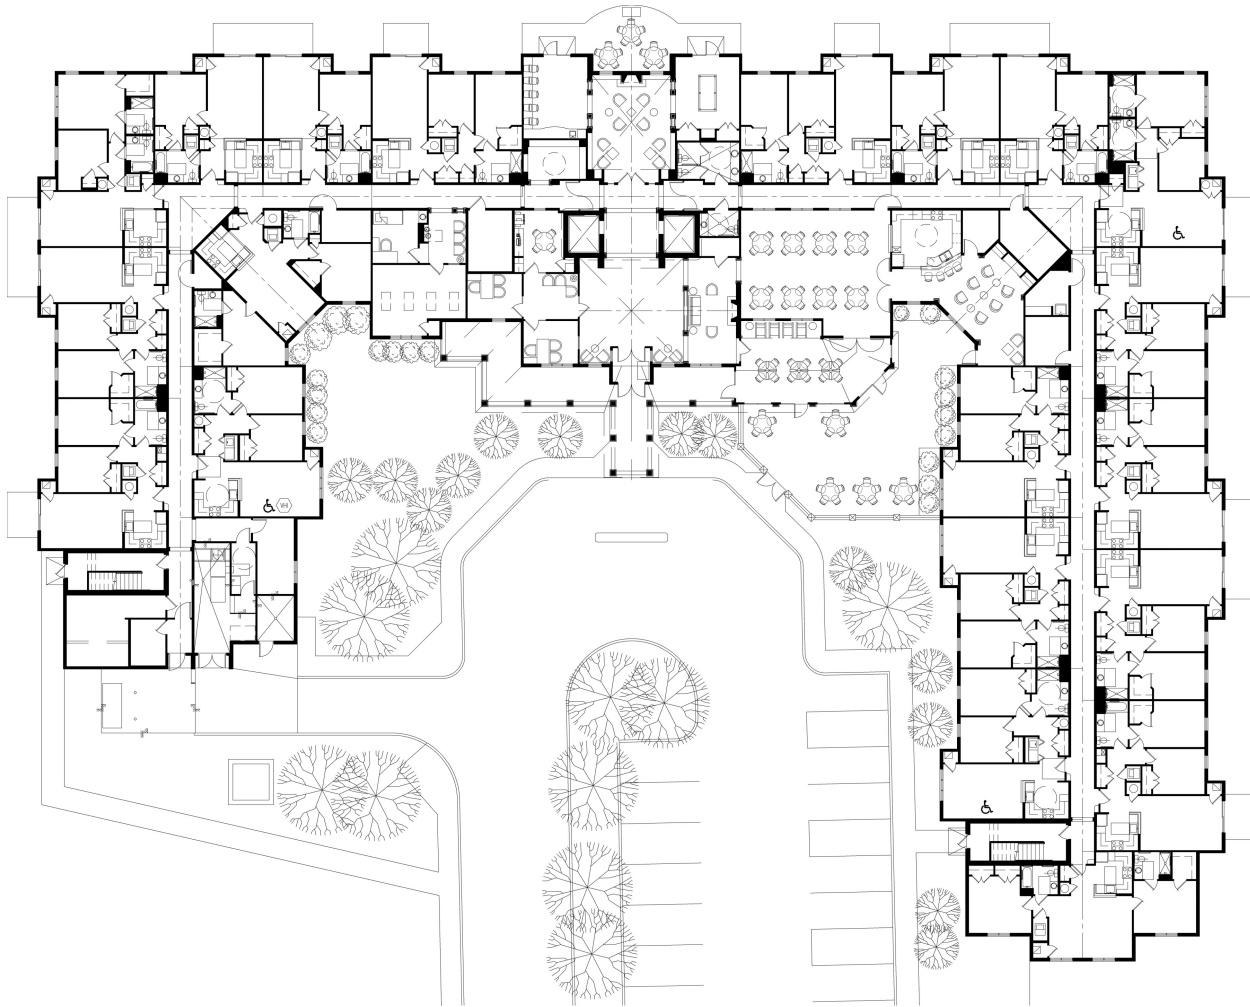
Proposed Multi-Family Building Floor plan. Plan represents a concept for how the building could be laid out. The layout will be modified to address site-specific constraints.
